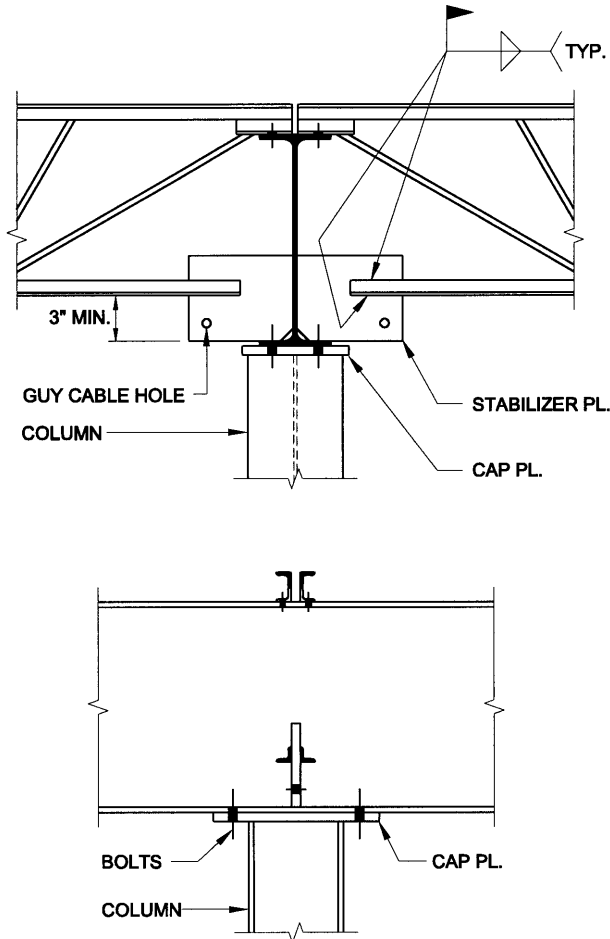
Beam framing continuously over column top, stability provided with welded joist-chord extensions above column top.
